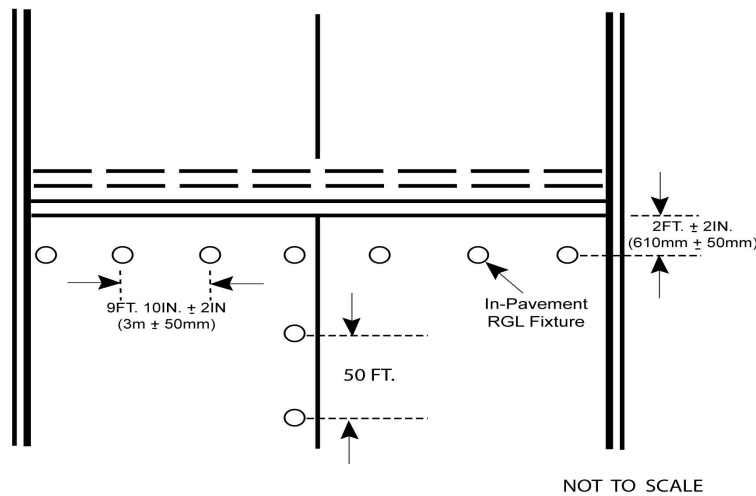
“T” Configuration of In-Pavement Runway Guard Lights
